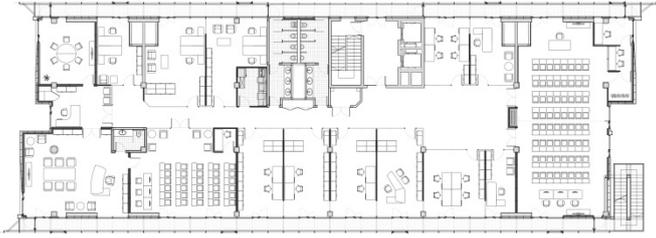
UZN, Podgorica, Montenegro_ typical floor plan
